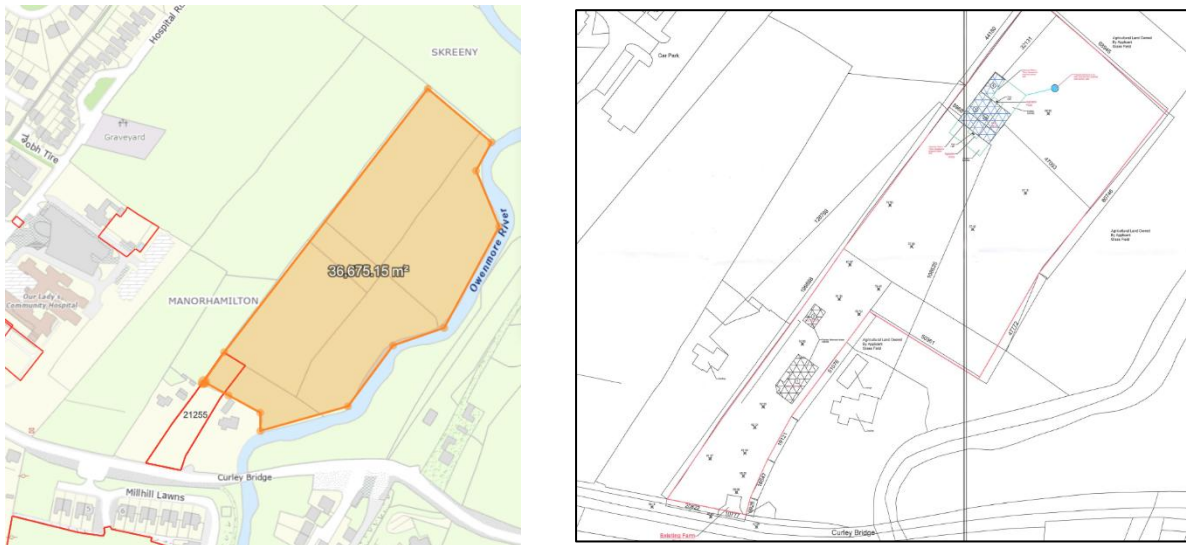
Applicant's landholding, (excluding the existing house) and proposed layout.
